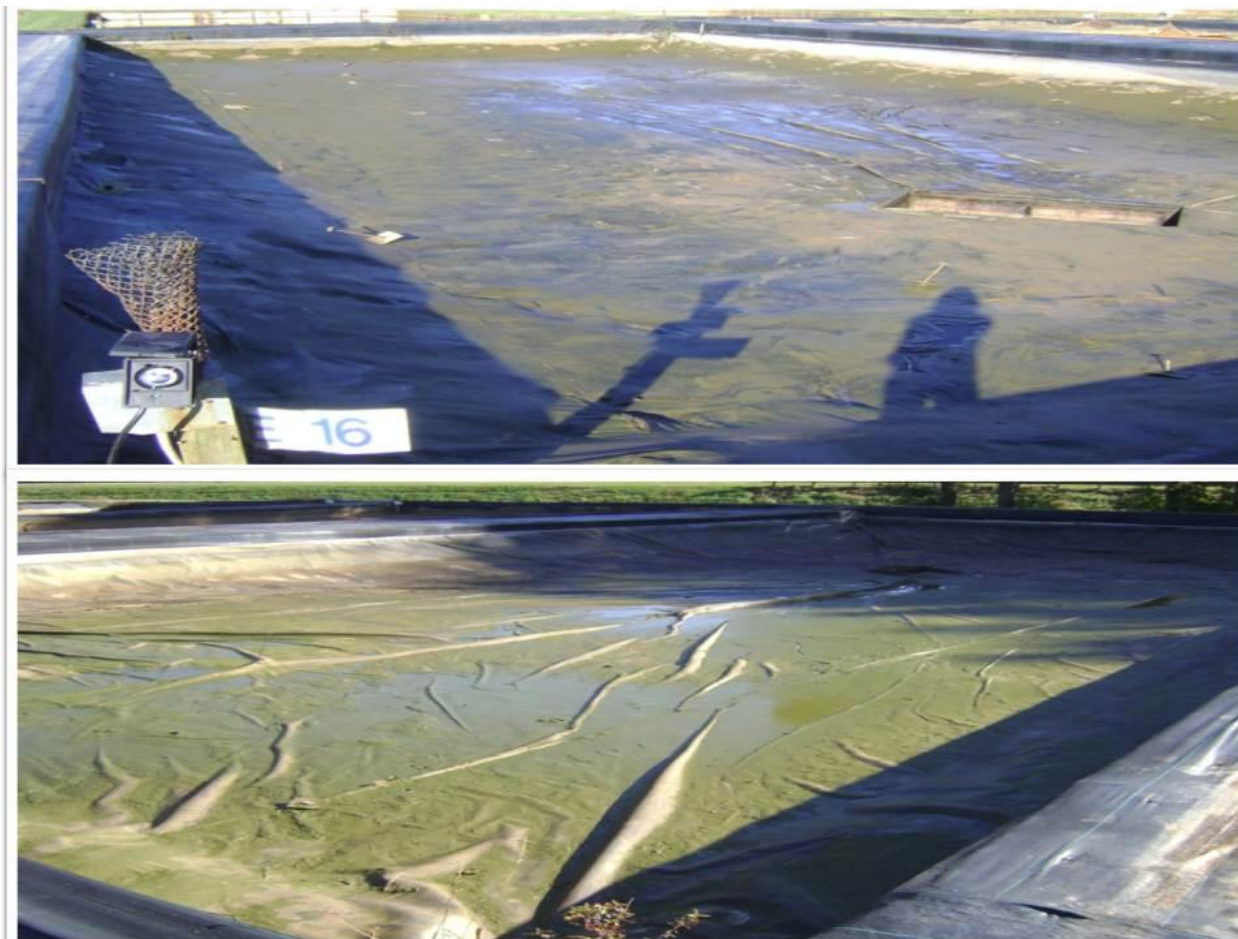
Photographs showing ponds lined with the black, Style 307 geotextile (upper) and the gray, style 3801G geotextile (lower).
